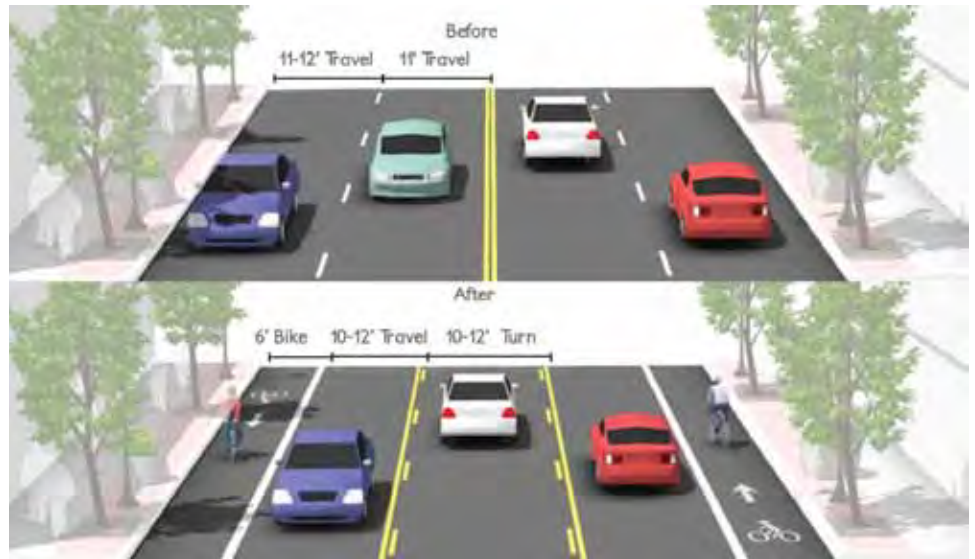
Sample from the Facility Design Guidelines (Appendix A) for a four to three lane road diet, adding bike lanes using the existing right of way width.
